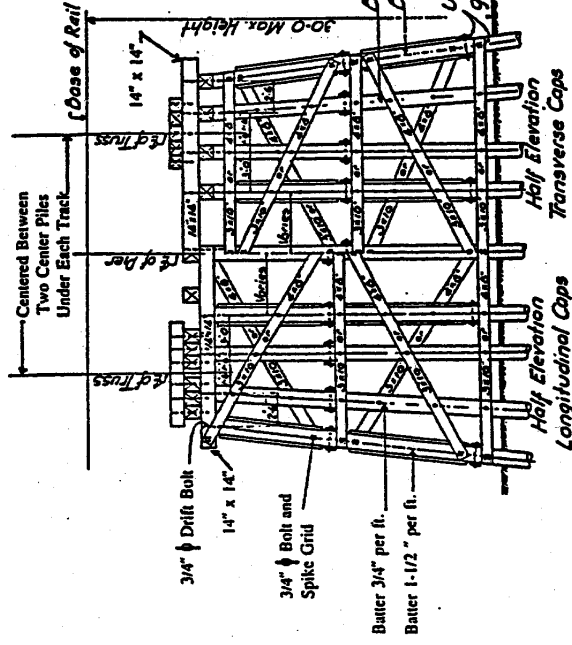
Recommended Practice for Crosotied Timber Pile Piers for Long Spans, E 60 Loading
